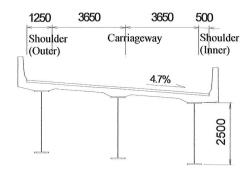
Cross section of Bridge Section (Excerpt from Technical Note)
